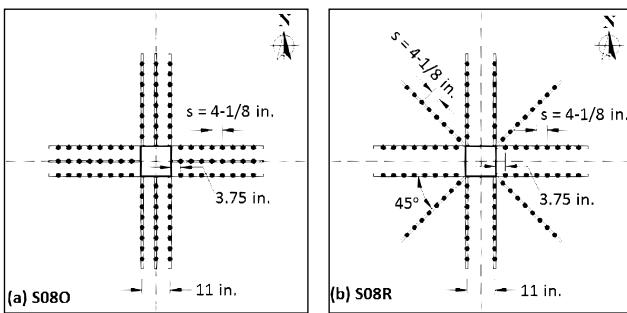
Shear stud layouts in S08O and S08R specimens([Dam and Wight, 2016](#)).
